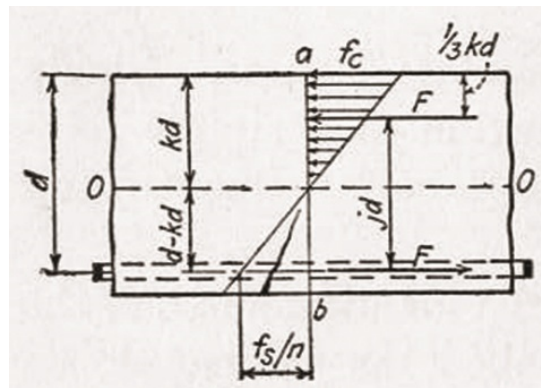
Stress Diagram for Reinforced Concrete Beam (Kirkham, 1932)
